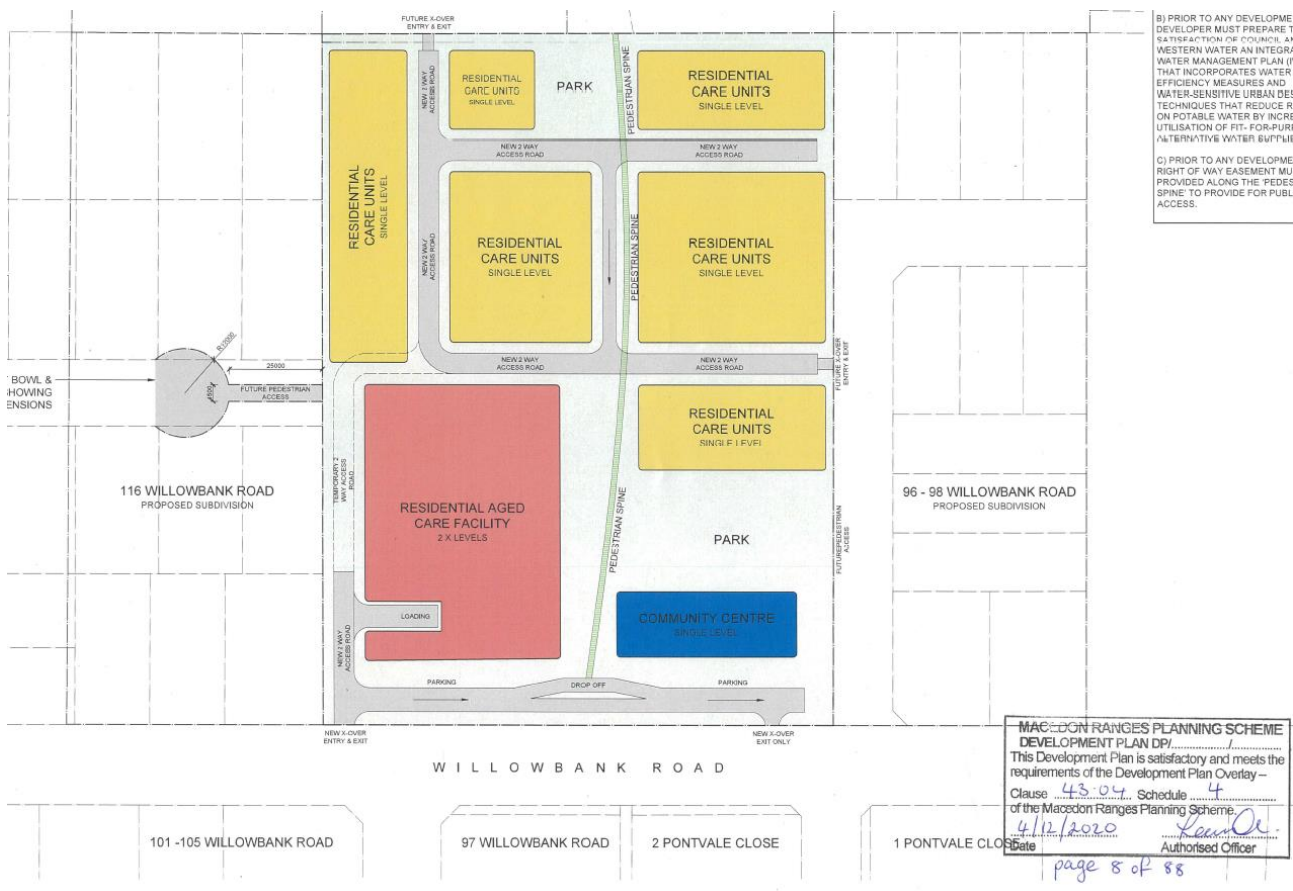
approved Development Plan for 110-112 Willowbank Road (diagonally opposite site) containing Aged Care and a Community Centre
